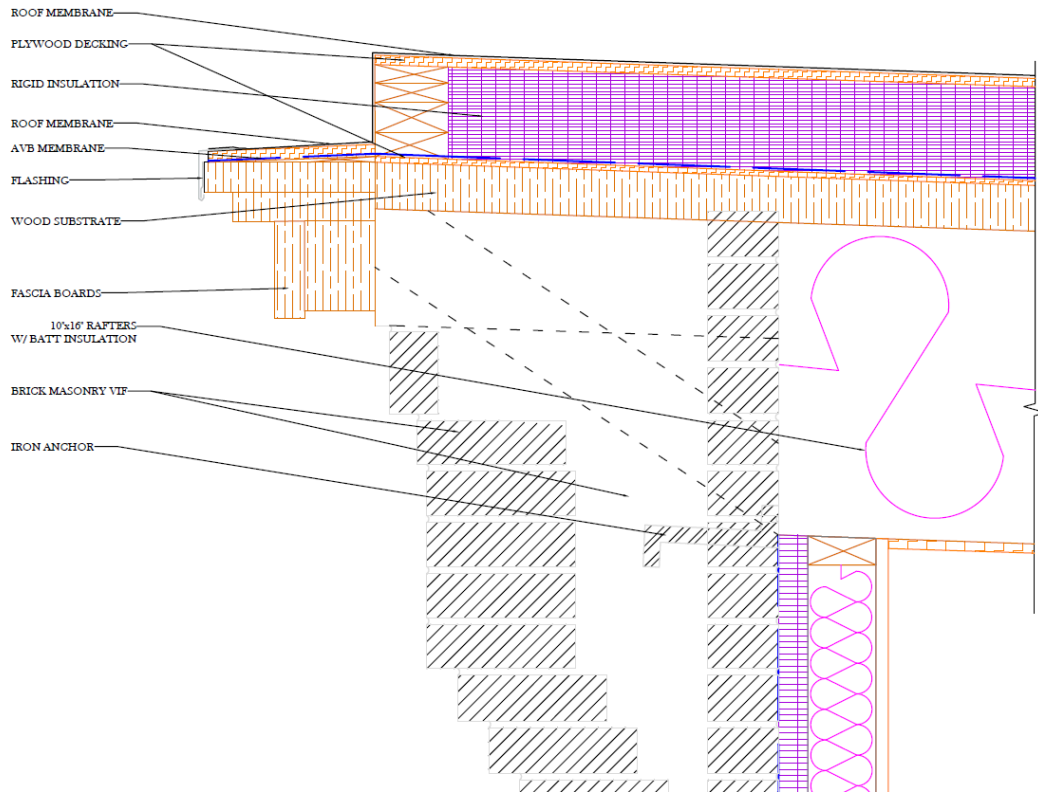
Stratton Hall Schematic Drawing 5-Wall to Roof Section
